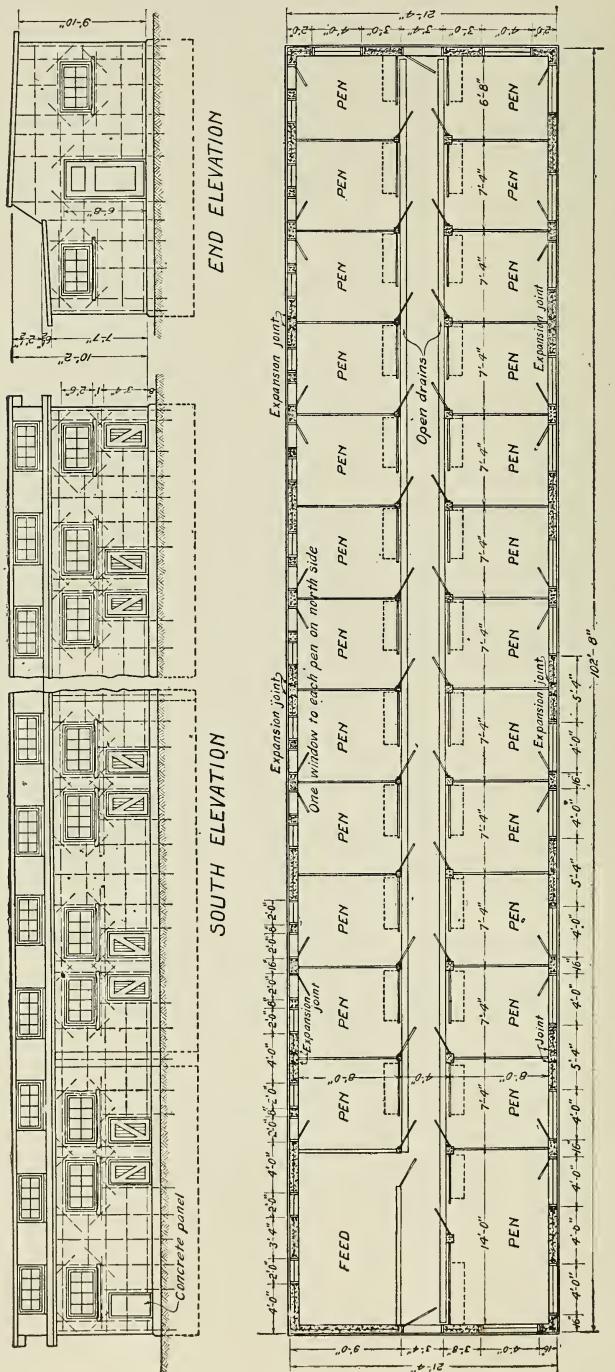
Plan of a Reinforced Concrete Hog-House, having 25 Pens and a Feed Room. When desired, concrete blocks may be substituted for monolithic walls, all of the dimensions being convenient for block construction.
